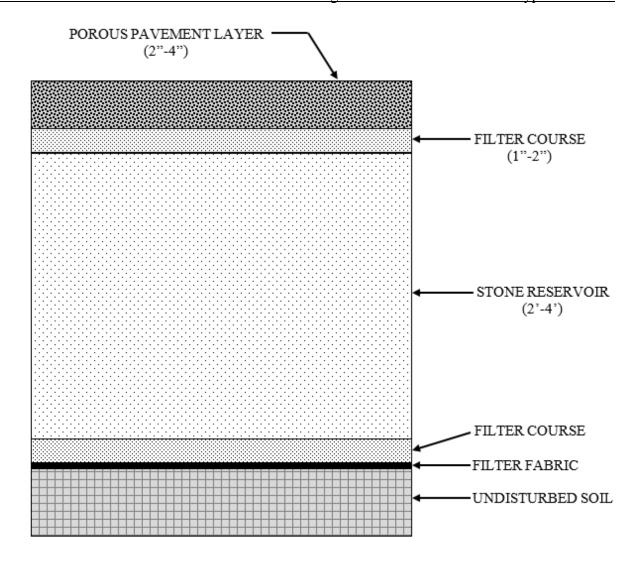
POROUS PAVEMENT TYPICAL SECTION
